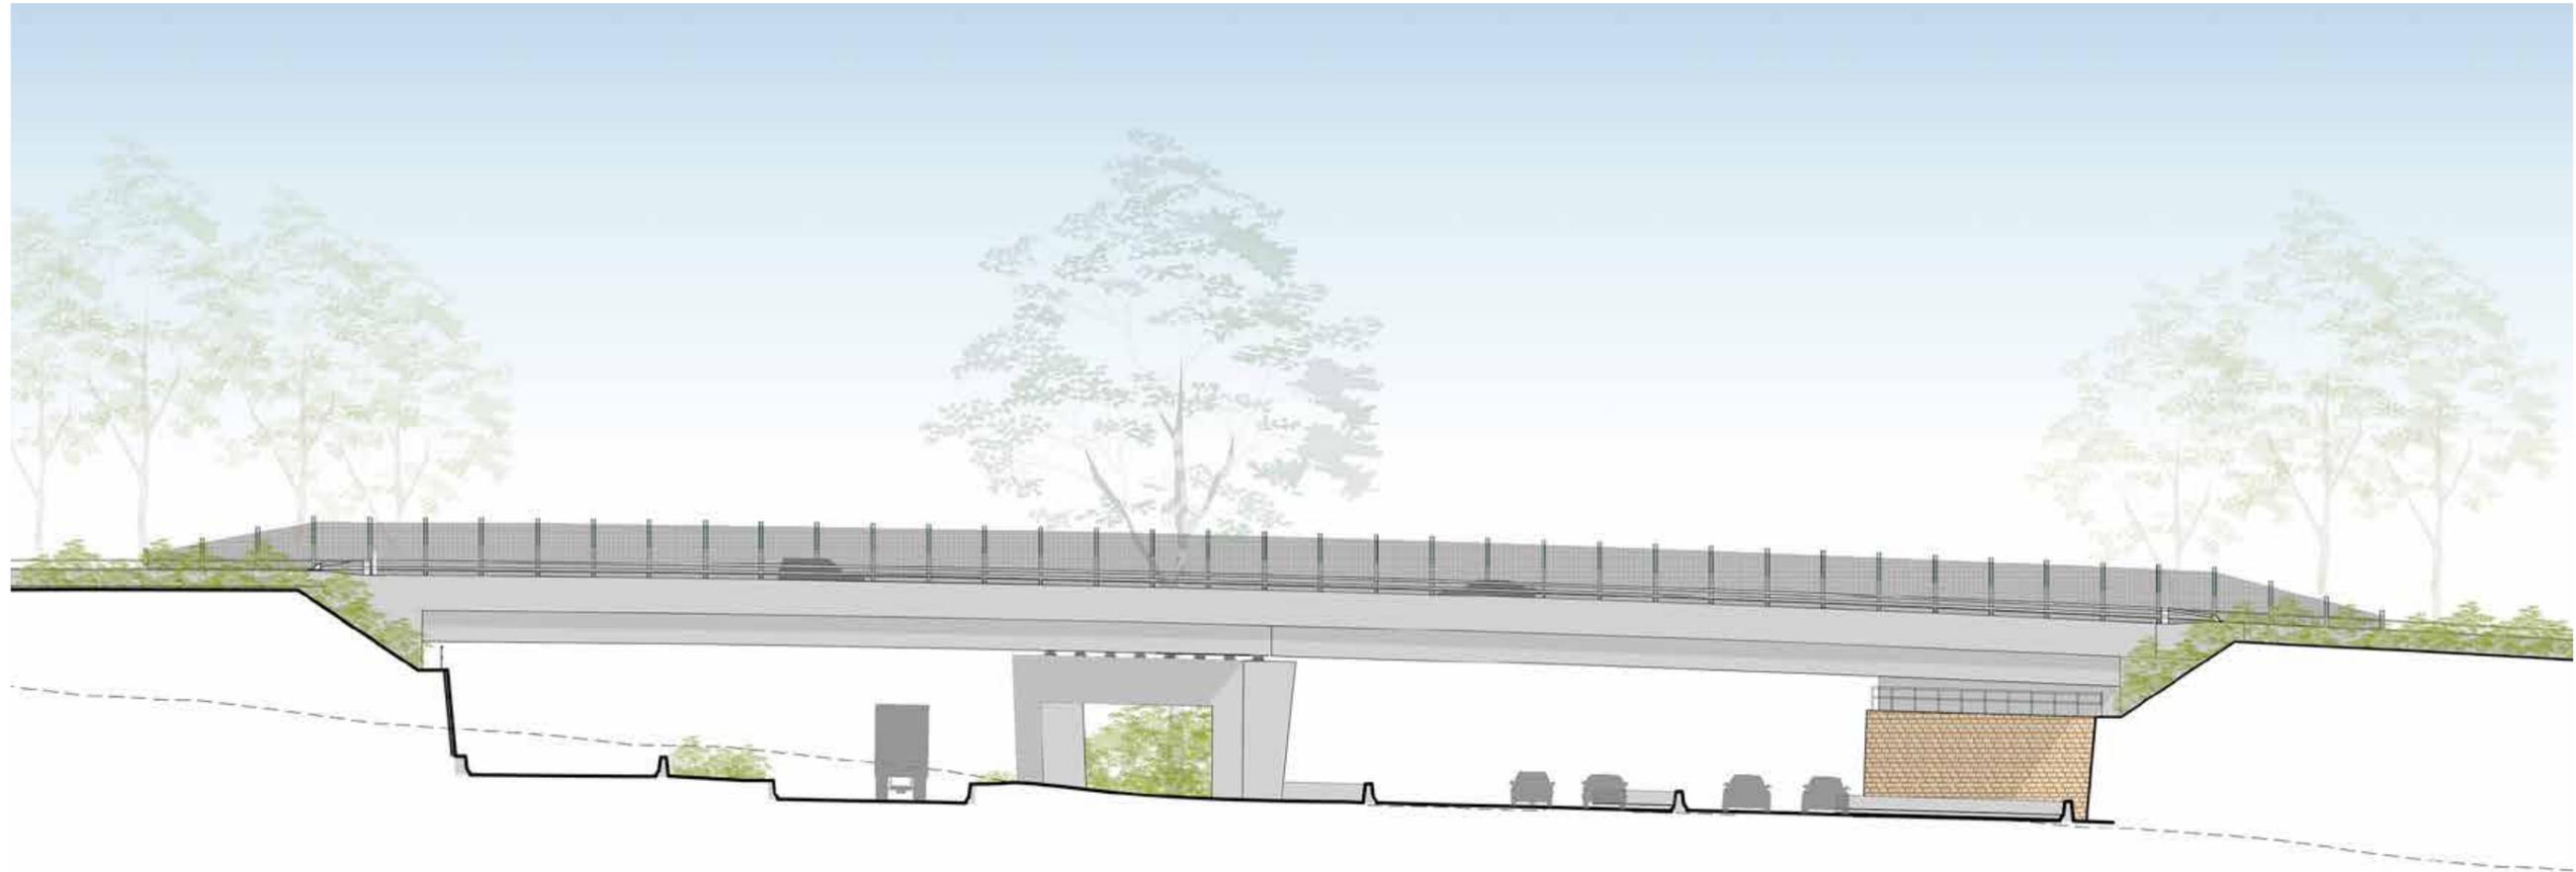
Elevation of bridge over M1 Princes Motorway - BR01 (Scale 1:300)
